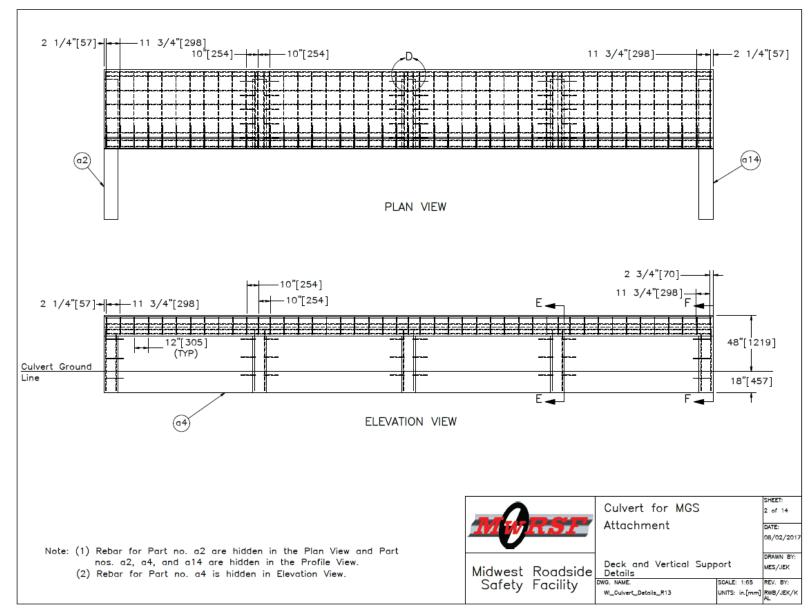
Top Slab and Vertical Support Wall Details, Test Nos. CMGS-1 and CMGS-2
